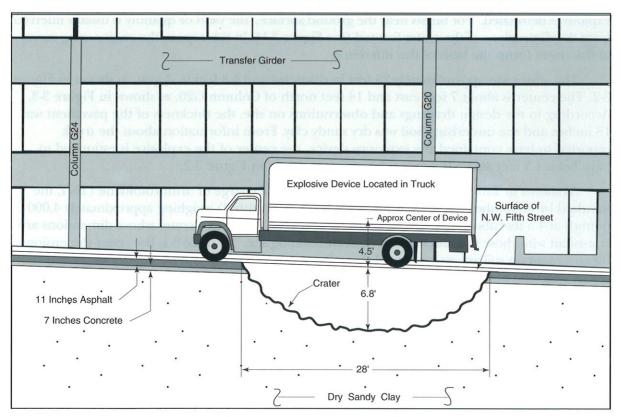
Approximate dimensions of crater at north face of Murrah Building.
